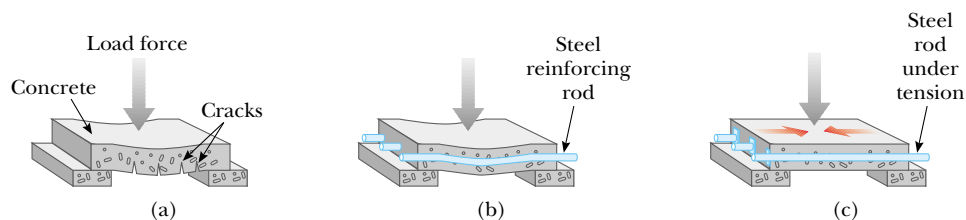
(a) A concrete slab with no reinforcement tends to crack under a heavy load. (b) The strength of the concrete is increased by using steel reinforcement rods. (c) The concrete is further strengthened by prestressing it with steel rods under tension.
